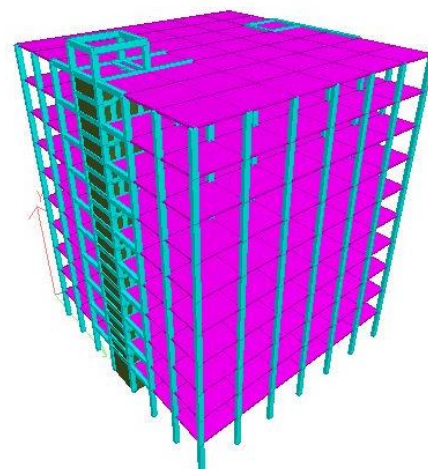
D VIEW OF FLAT SLAB WITHOUT SHEAR WALL
